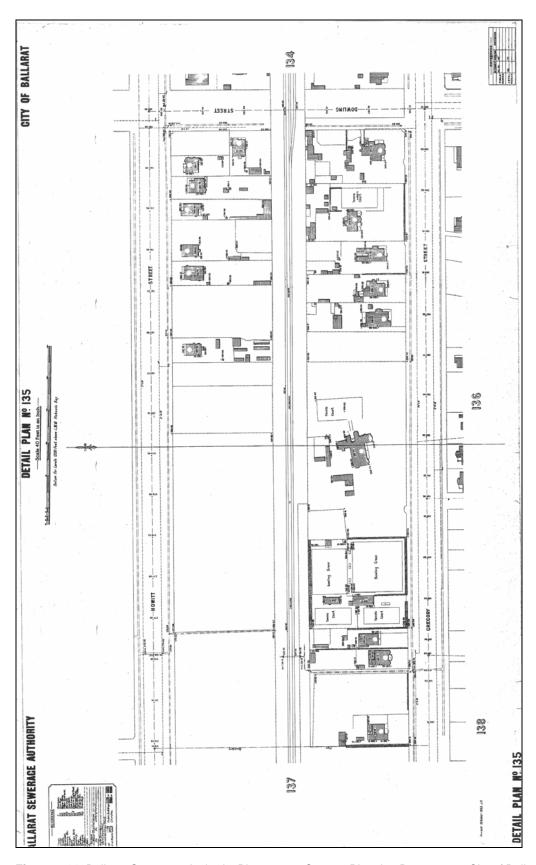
Ballarat Sewerage Authority Plan, 1933. Source: Planning Department, City of Ballarat.
